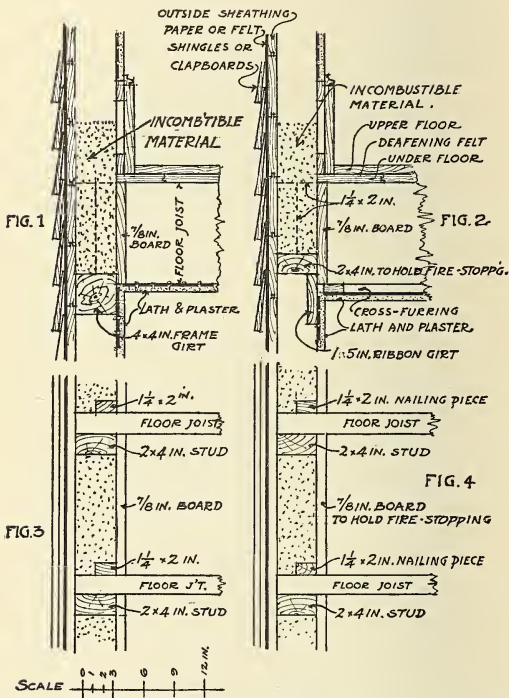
AND 3.—Elevation and plan showing fire-stopping of wall of frame building at line of sill and between studs and floor joists.
